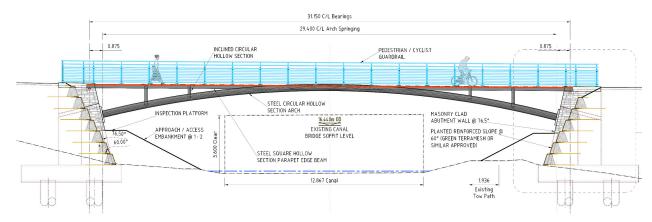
Proposed Span Arrangement of the Shared Use Cycle and Pedestrian Bridge
